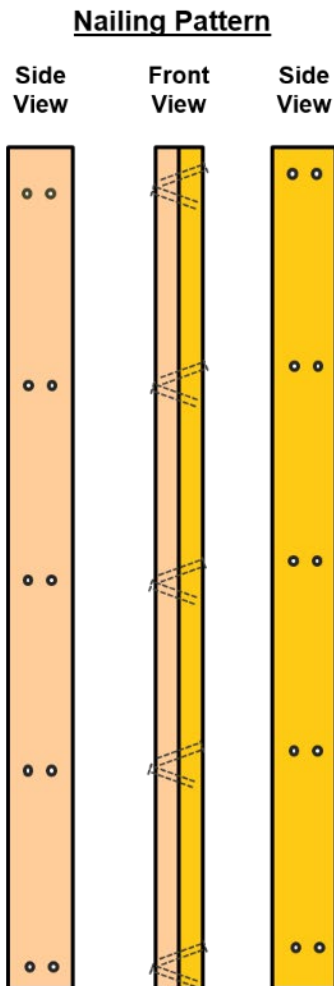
Nailing Pattern for Connecting Walls, Clamping as Needed
